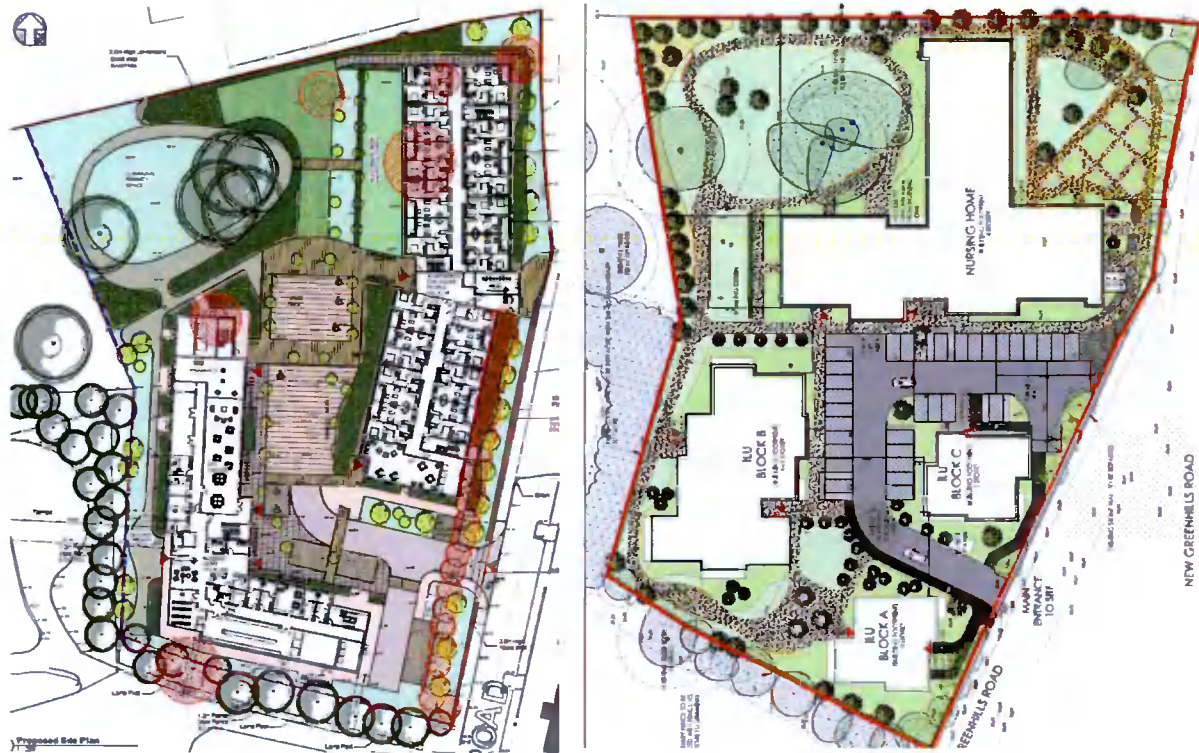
Refused Site Layout Plan and the proposed Site Layout Plan
